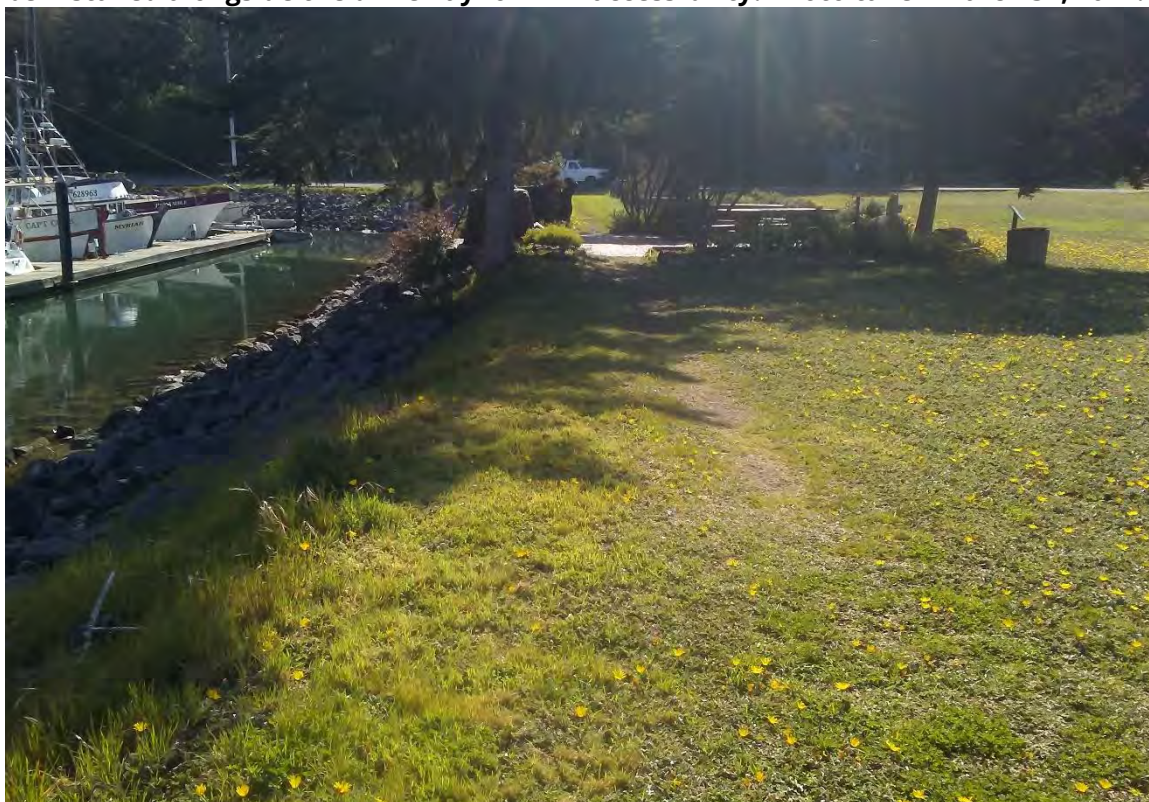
Looking south along the top of bank along the Noyo River and marina. Note existing path to picnic tables to be refurbished. Photo taken March 31, 2022.
